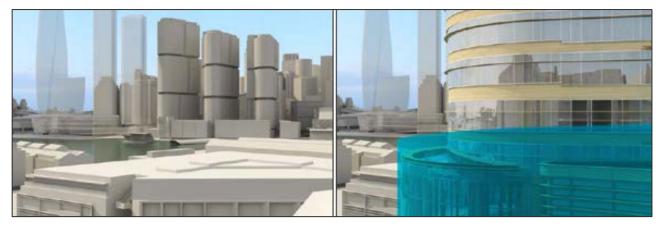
| Existing (left) and proposed (right) view east from balcony of east facing apartment on level 8 (50mm focal length). Note: blue shading denotes LEP compliant building envelope (Source Proponent's VIA)
